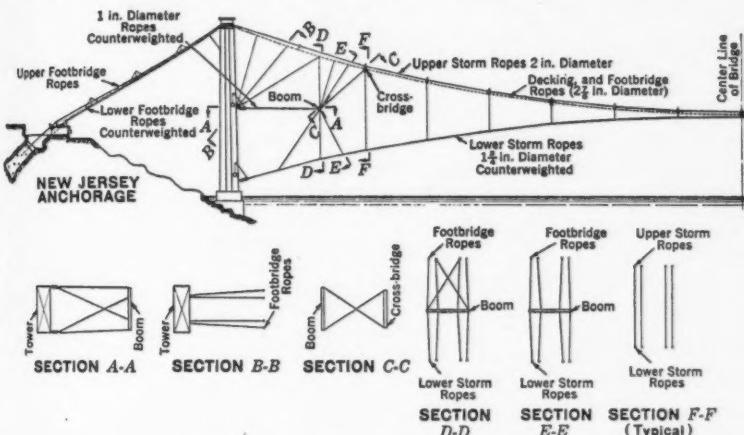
CROSS-SECTIONS OF STORM SYSTEM.
